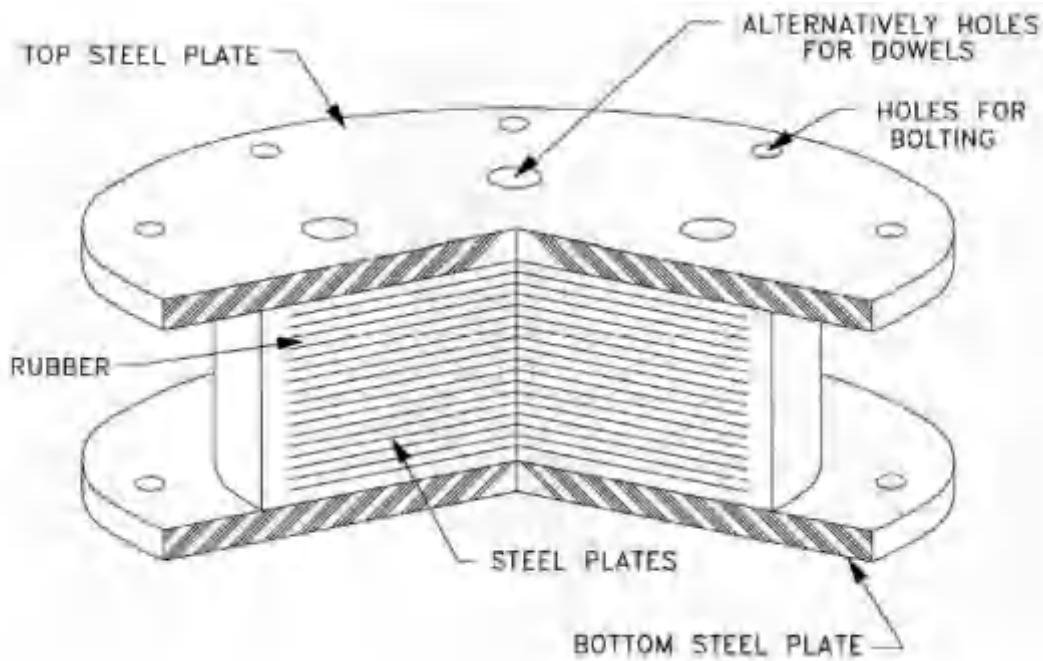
Cross-section of a typical elastomeric bearing (Constantinou et al. 2007)
